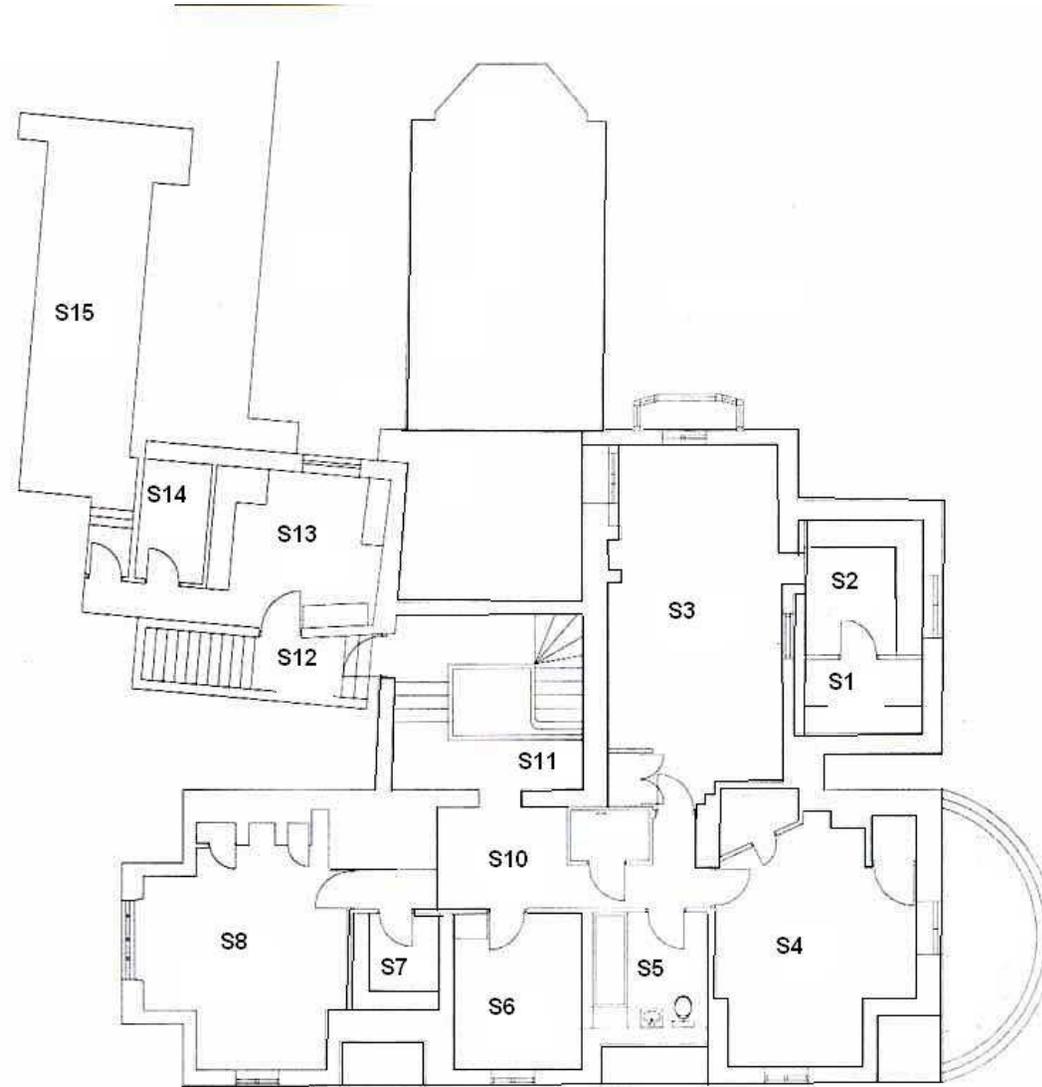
Second-floor plan of Greys Court, showing the room numbers referred to in the text.
